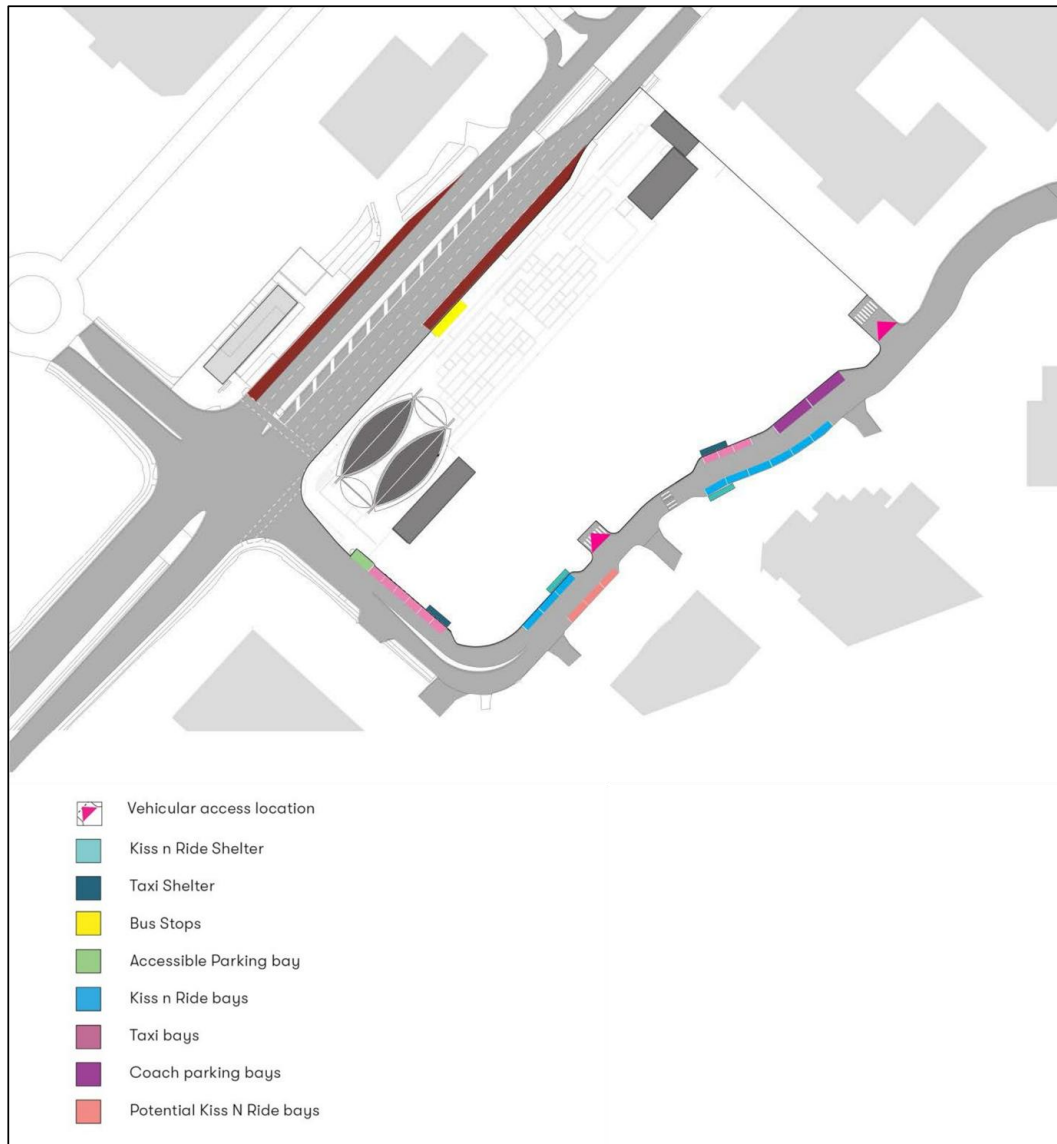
Vehicular Access and Transport Facilities Plan – Norwest Station site
